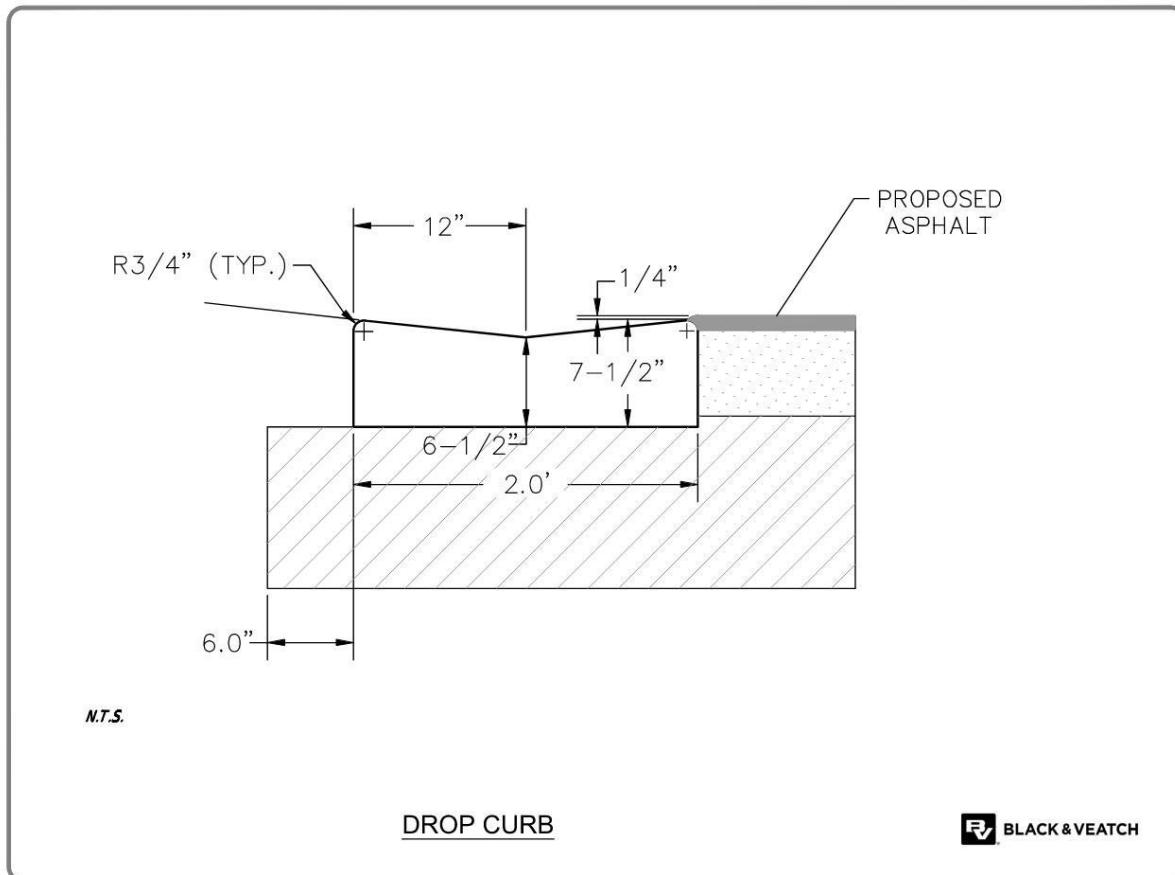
Standard Detail Depicting a Typical Drop Curb and Gutter System
